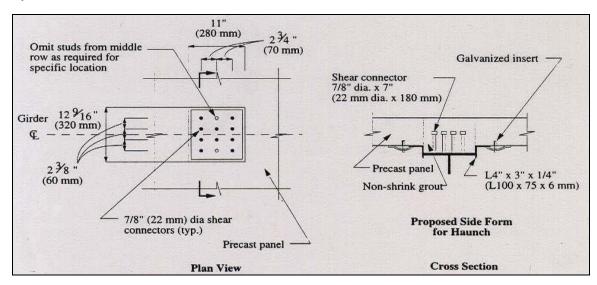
Details of the panel-to-girder connection used on Queen Elizabeth Way-Welland River Bridge, Ontario, Canada<sup>2</sup>
